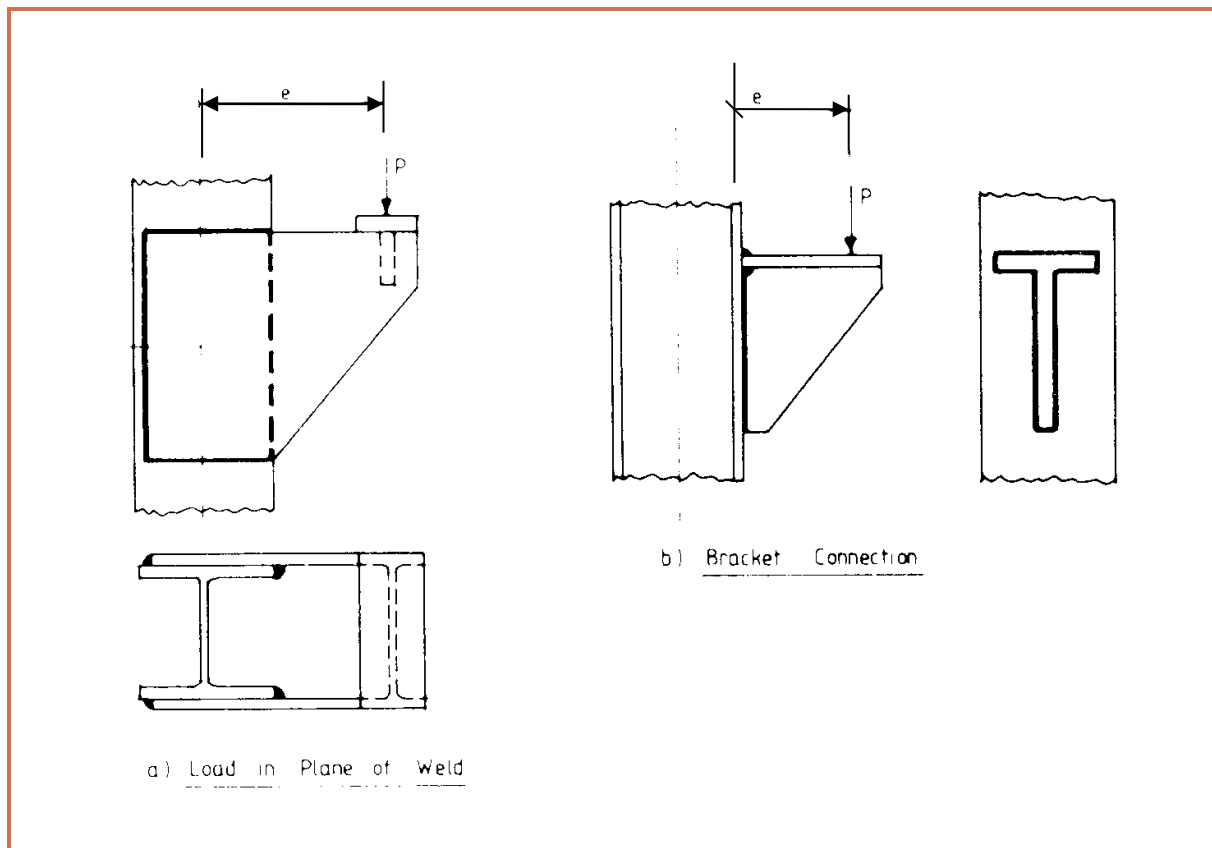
Eccentrically Loaded Welded Connections
